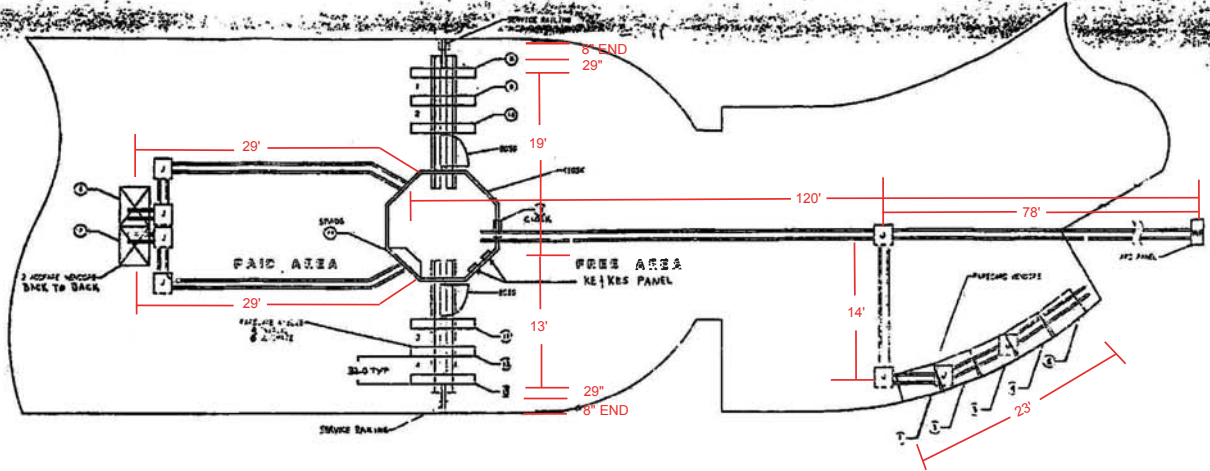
E03 U Street West – Essential SWBD – Panel WF Circuit 3
